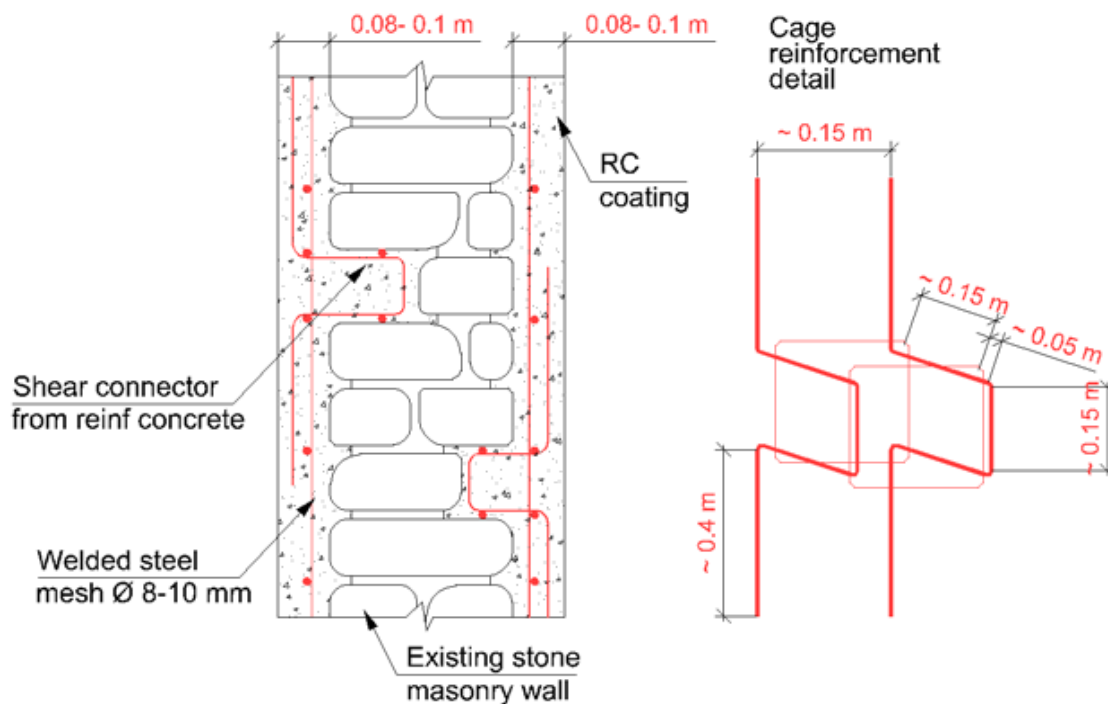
b Detail of a connector for bonding the RC coating to stone masonry wall [51]
